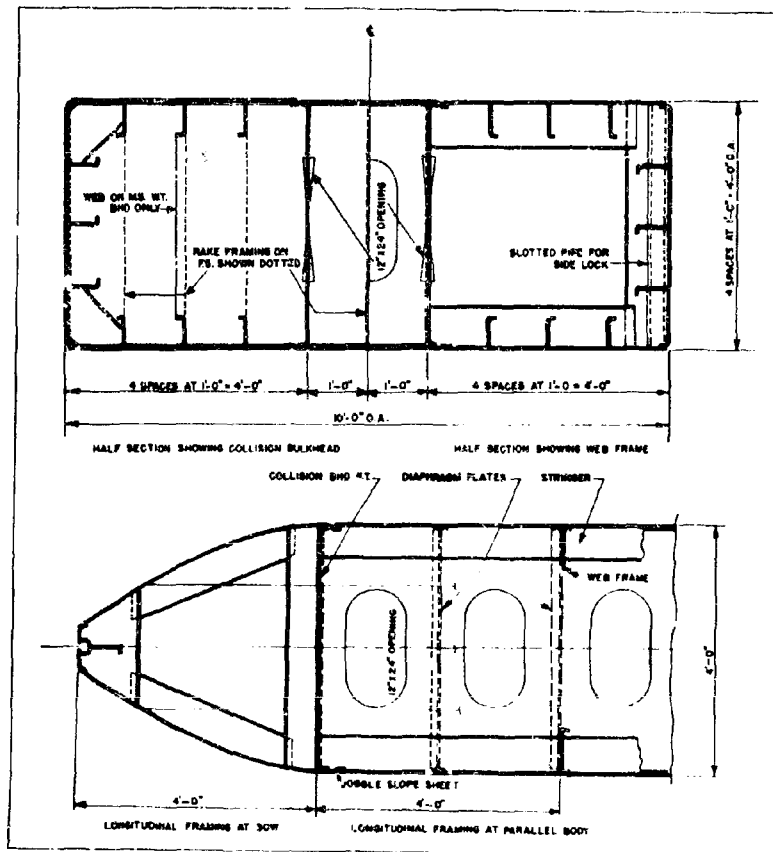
Plan and side elevation of pontoon for 10-ton tank pontoon barge.
